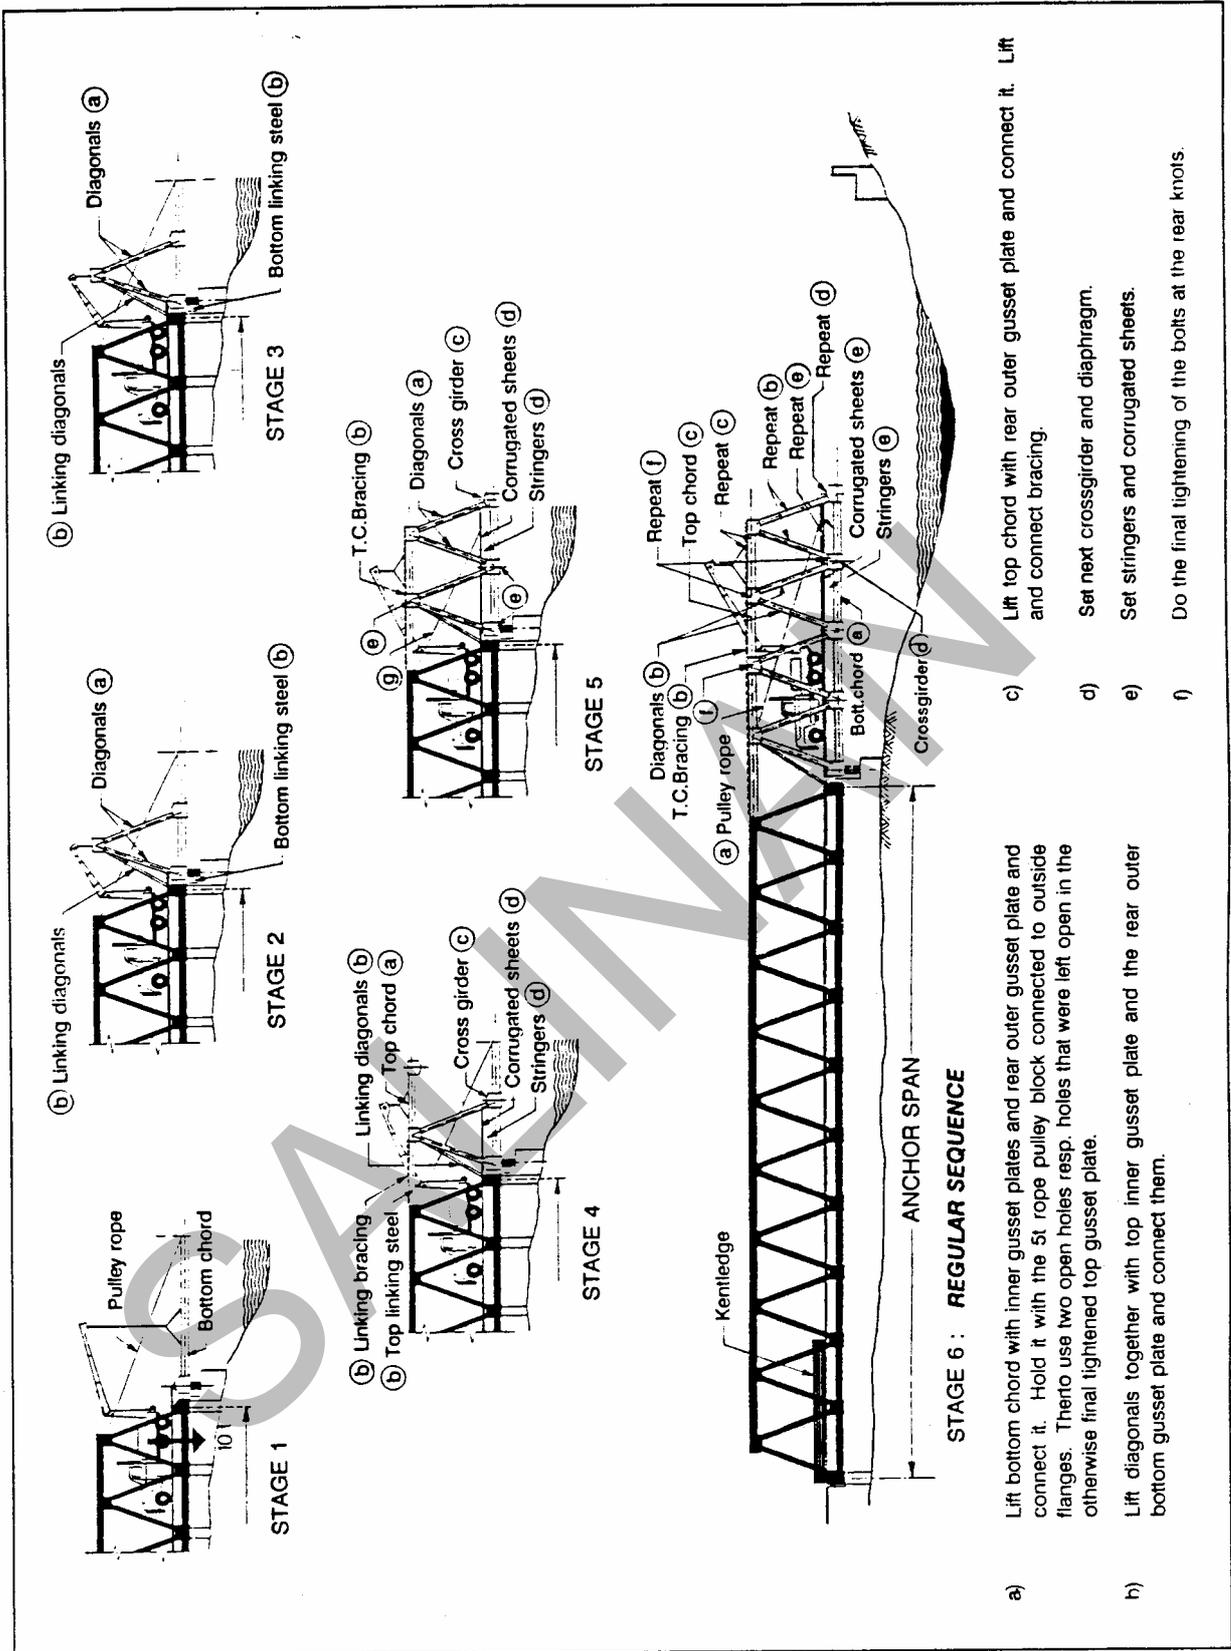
Austrian Permanent Truss - Erection by Cantilever Method
